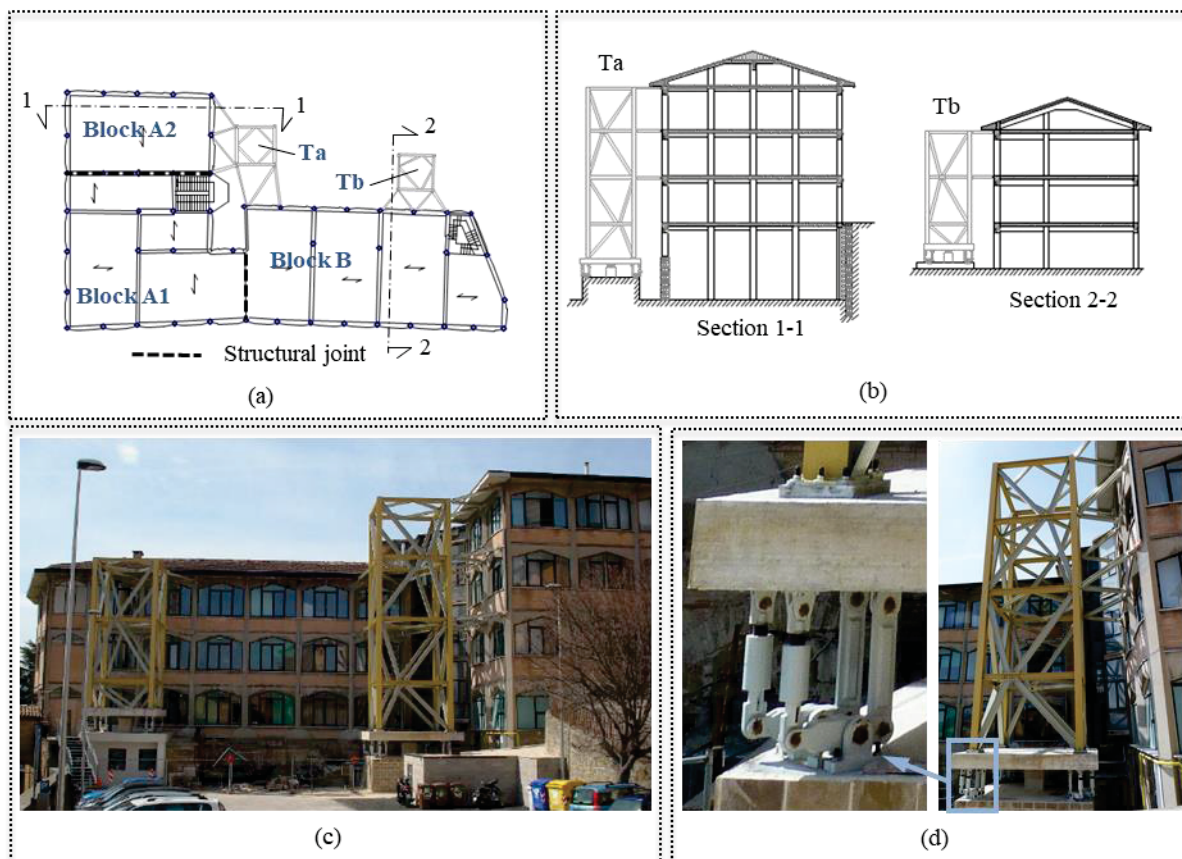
The Costanza da Varano high school: (a) plan view; (b) cross-section; (c) photo of the building; (d) photo of the Dissipative Towers with details of the dampers.
